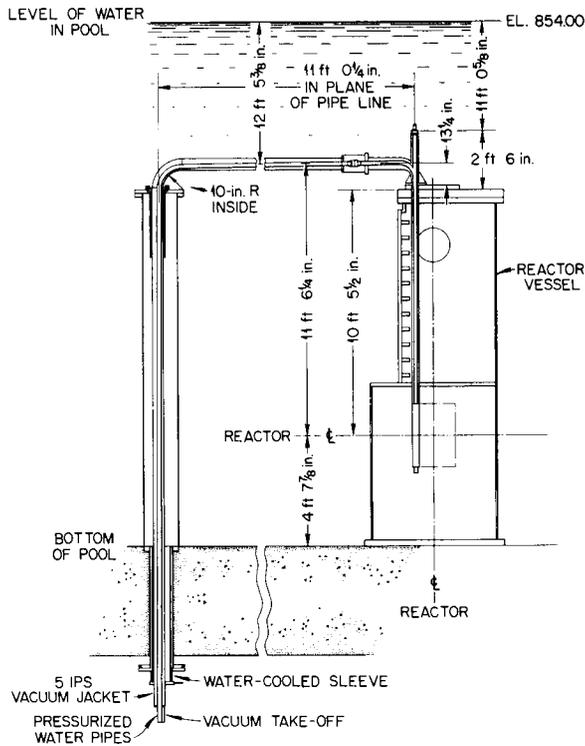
Elevation Drawing of Pressurized-Water In-Pile Test Loop.
